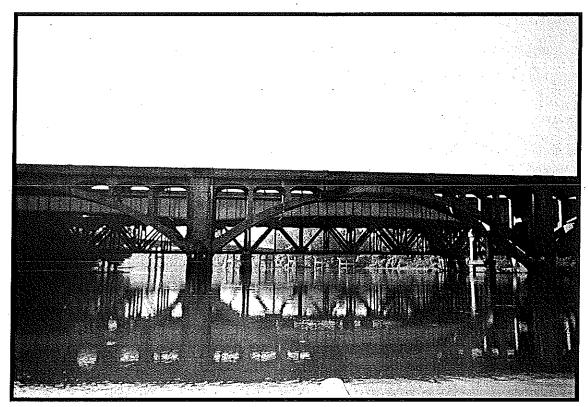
Looking downstream toward upstream elevation of Wilcox Bridge. US 29, North Carolina Railroad, and I-85 bridges in background.
